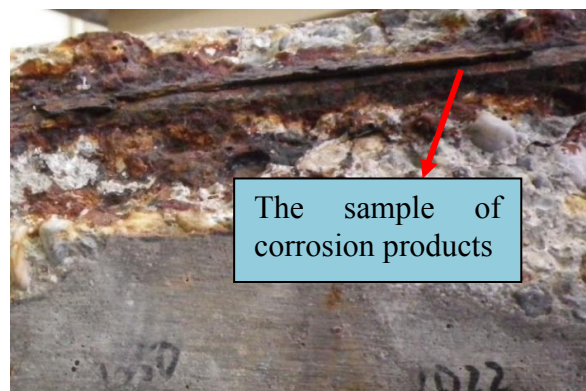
Sample TBS-IV at the spalling zone of tensile reinforcement
